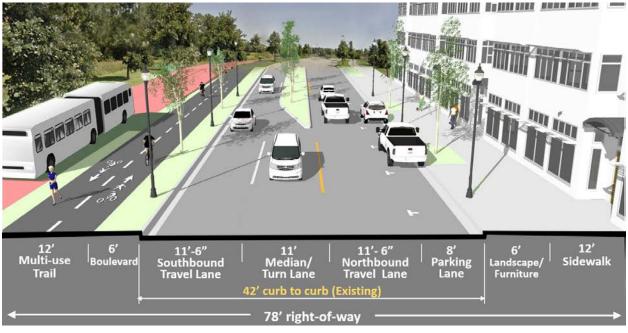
HELMO AVENUE N. (LOOKING NORTH)
